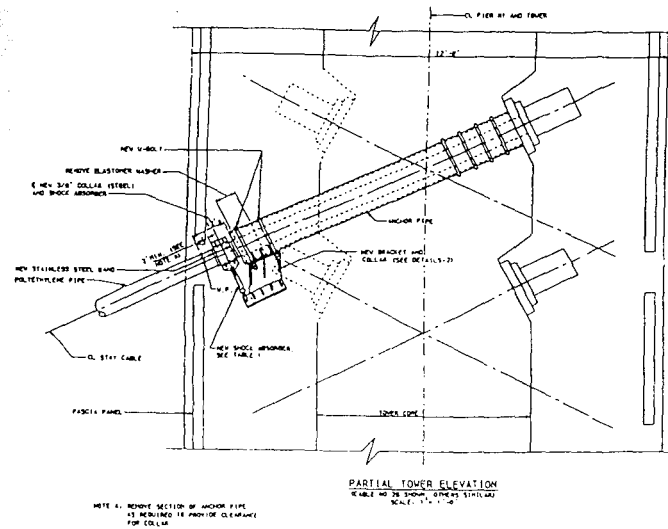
Hydraulic Damper Detail - East Huntington Bridge
